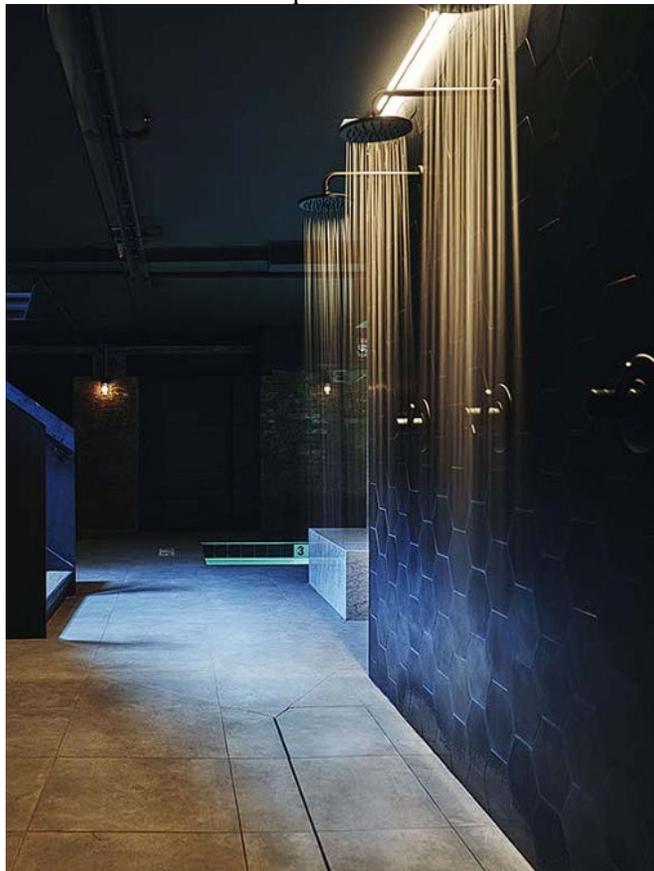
View of new showers and drains installed in cellar for Bathhouse.
